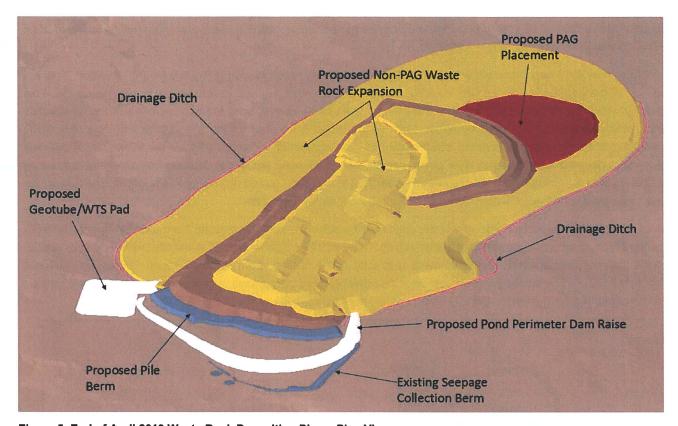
End of April 2019 Waste Rock Deposition Plan – Plan View
